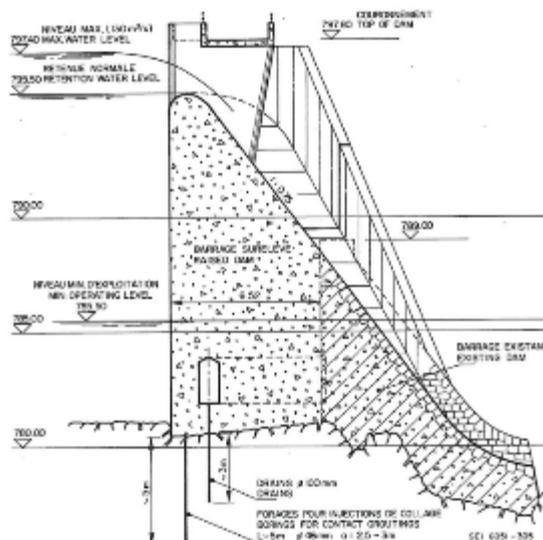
Käppelistutz dam cross section, Source: Stamm (1984)
